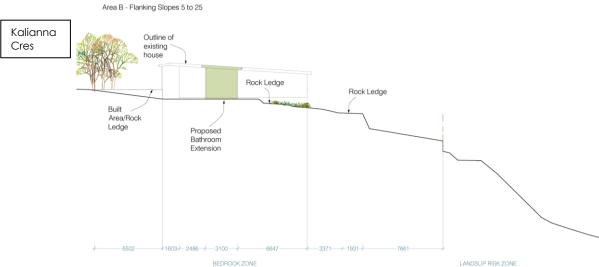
Landslip Risk area is located away from existing house and new proposed extension
